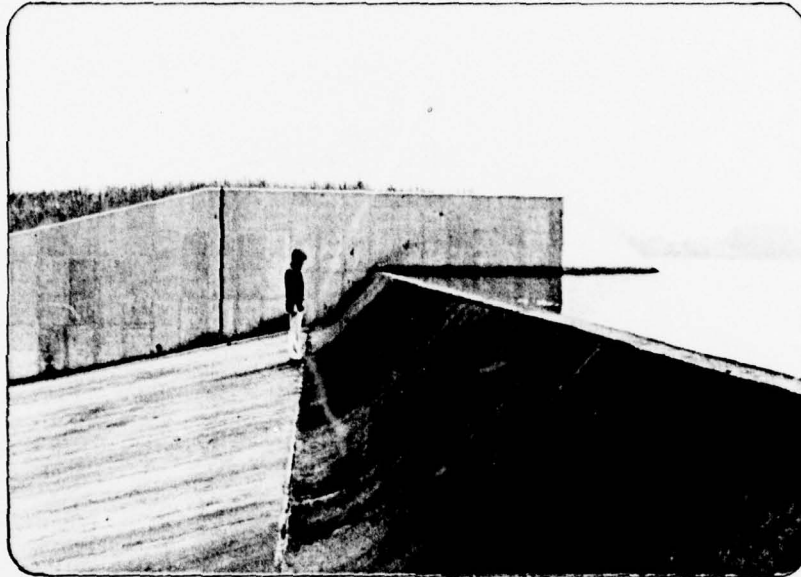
View of Auxillary Spillway Looking Upstream (Note: head wall for 12 inch A.C.C.M.P. to left of channel and gablon wall and lining to right of center.)
